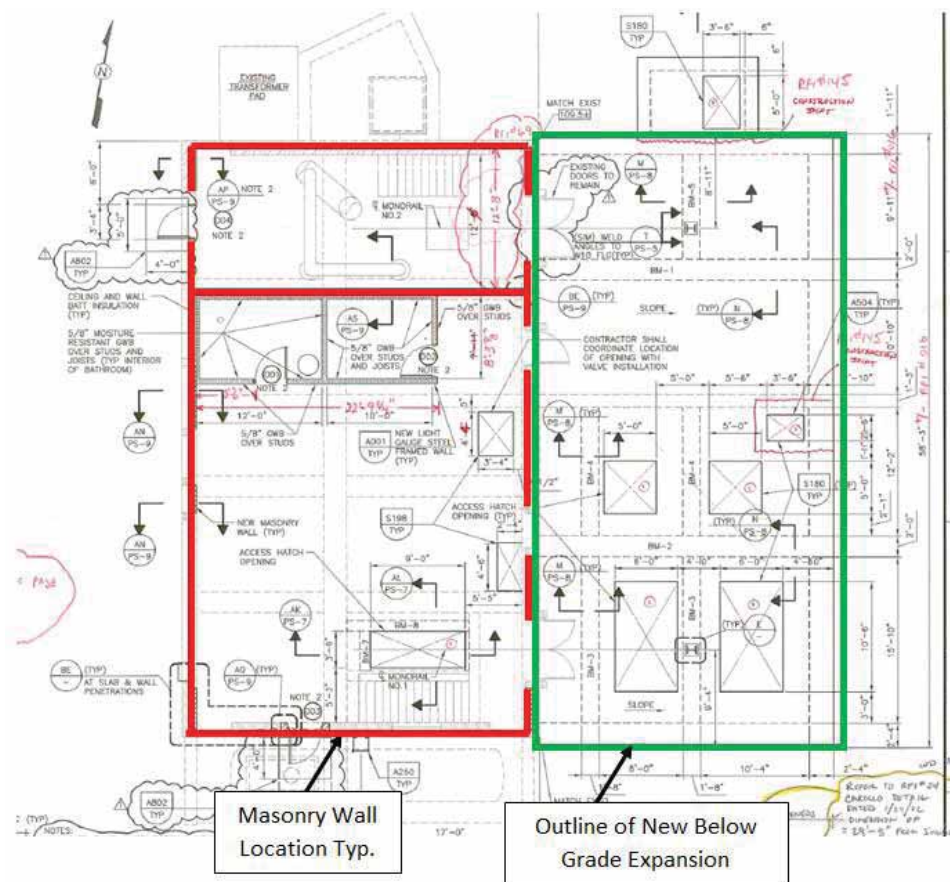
Irvington Pump Station Masonry Wall Locations and Expansion Extent
